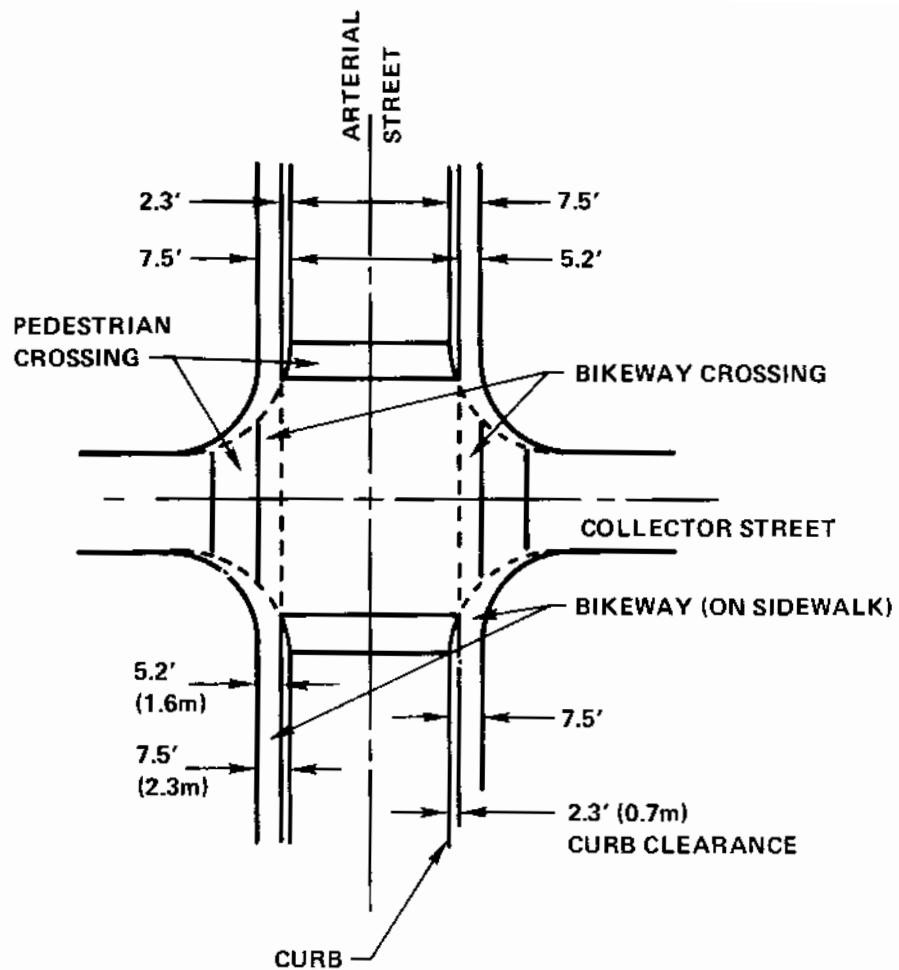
Recommended German Intersection Design: Bikeway on the Sidewalk of an Arterial Street Crossing a Collector Street. (Ref. 26, p. 18).
